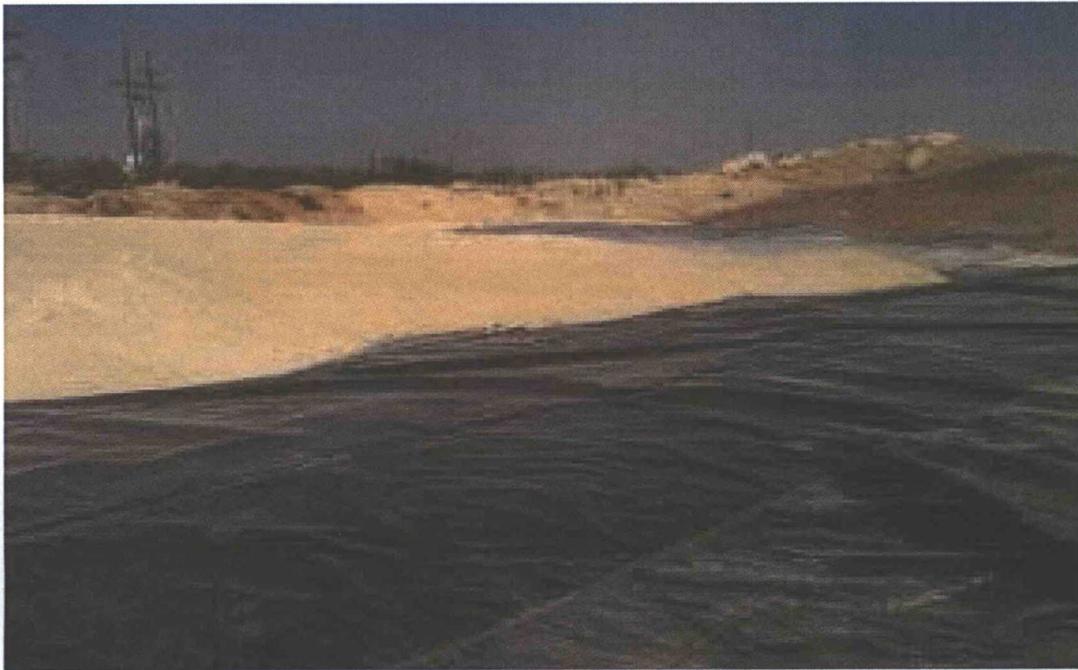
View of 20 mil poly liner installation/backfill facing northwest
